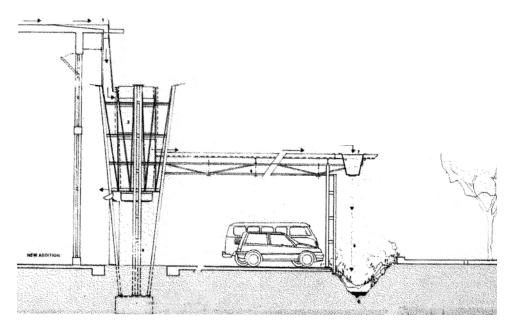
Cross-section of Brown + Story Proposal for the Trinity-Bellwoods Recreation Centre Parking Lot
